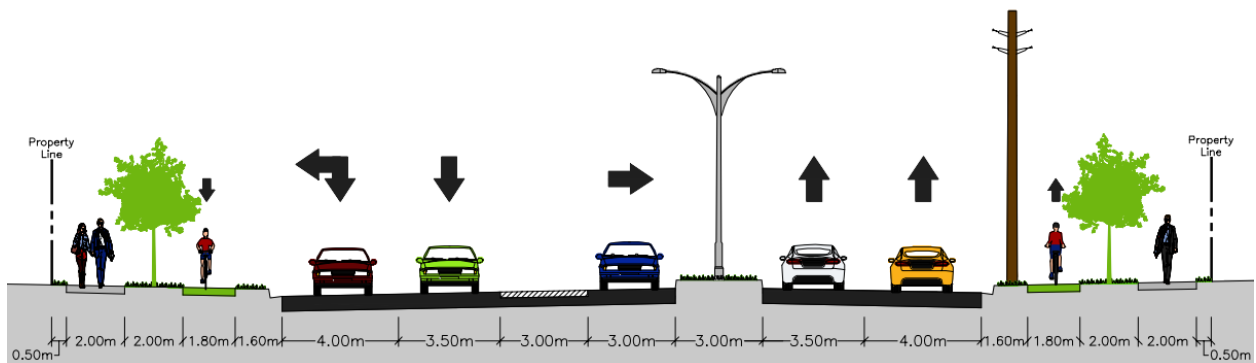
Preferred Richmond Street Cross-Section, North of Fanshawe Park Road
